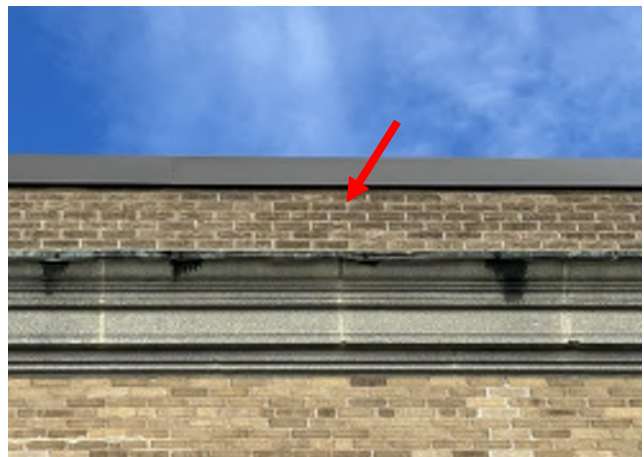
Closer view shows textured replacement brick masonry units that had been installed on the east wing parapet. Textured bricks were observed the full length of the parapet on this elevation.
